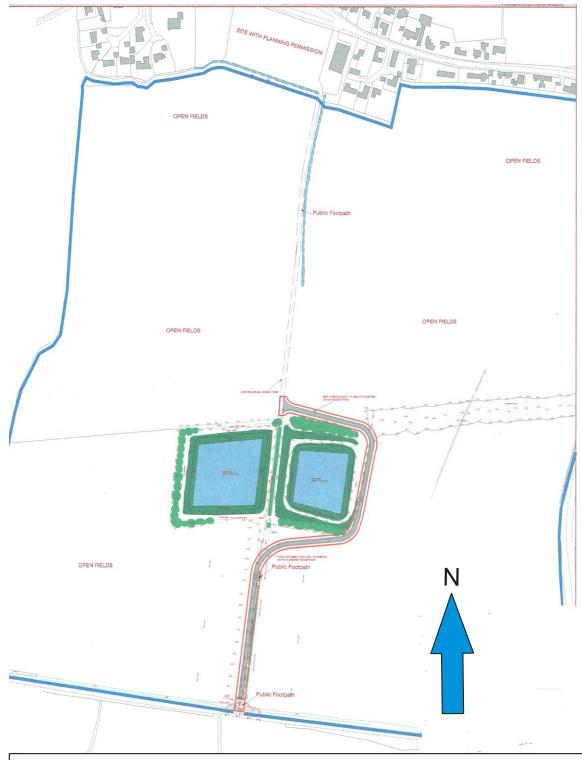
Site location at an original scale of 1:2,500 at A3, (extract from Architects plan), showing the proposed layout of the development site
